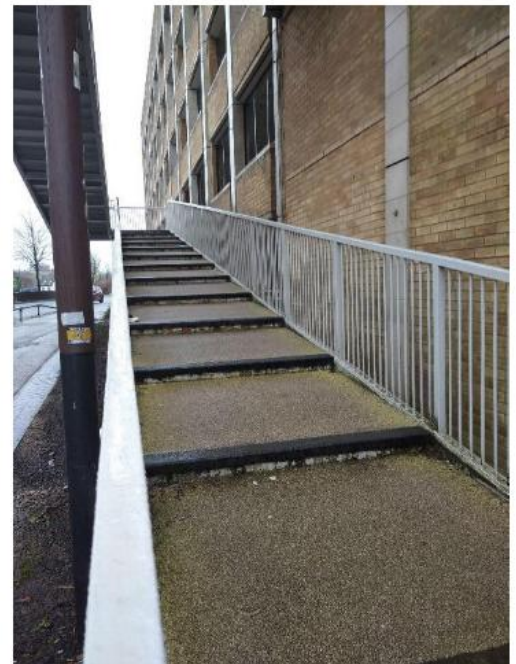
Stair Access on Pedestrian Footbridge to Queensgate Shopping Centre
